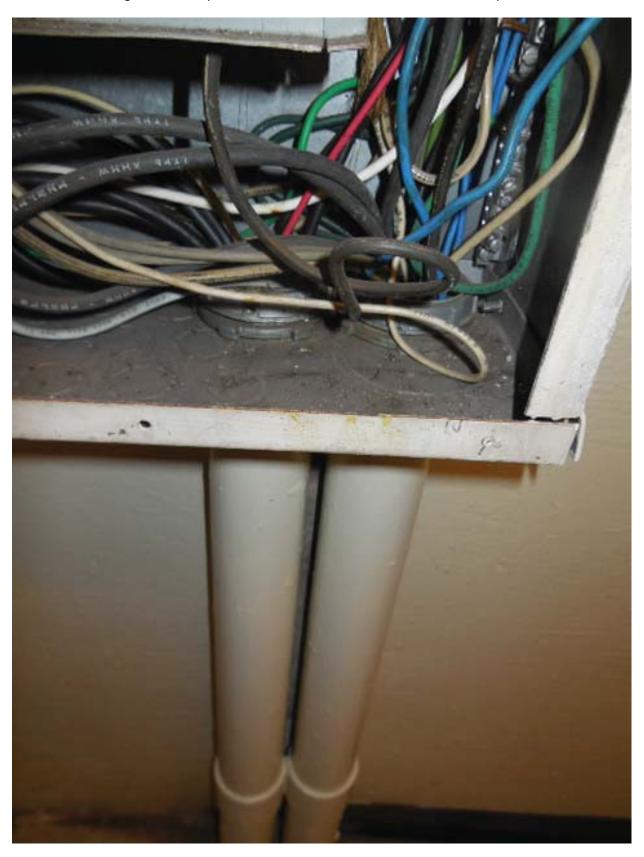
C06 Arlington Cemetery – AFC Panel F-1 in Room 100
